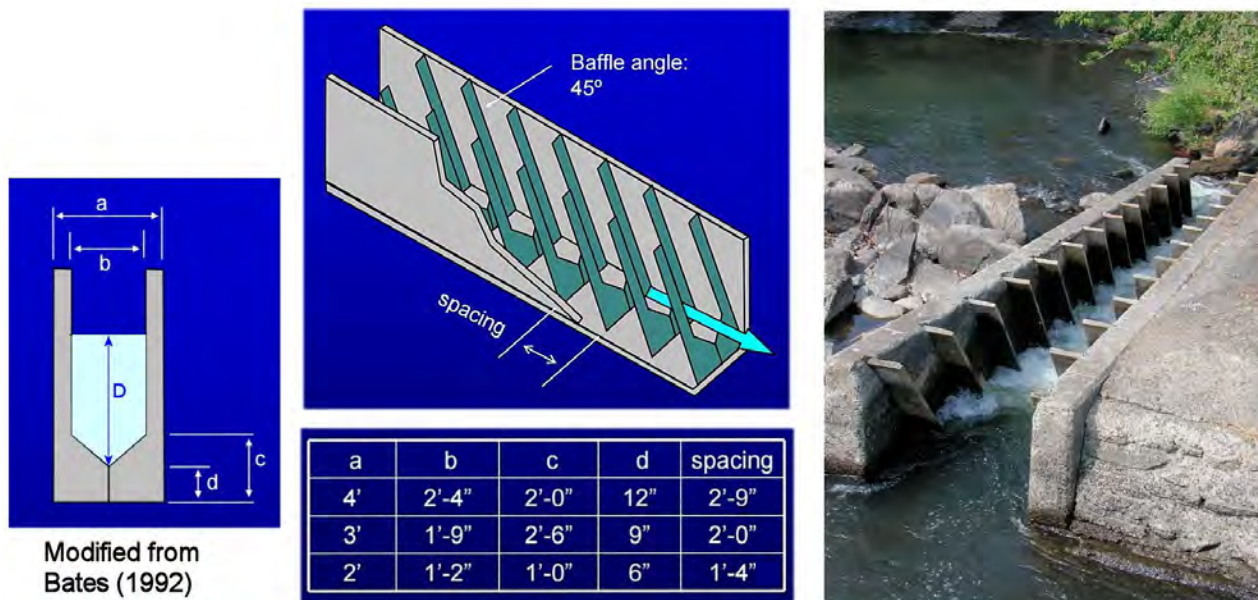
Drawings, dimensions, and a photo of a Denil fishway
